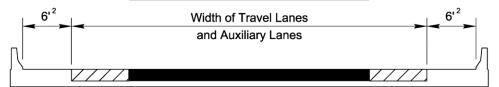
Arterial System Bridge Deck Widths for Four or More Lanes Undivided
